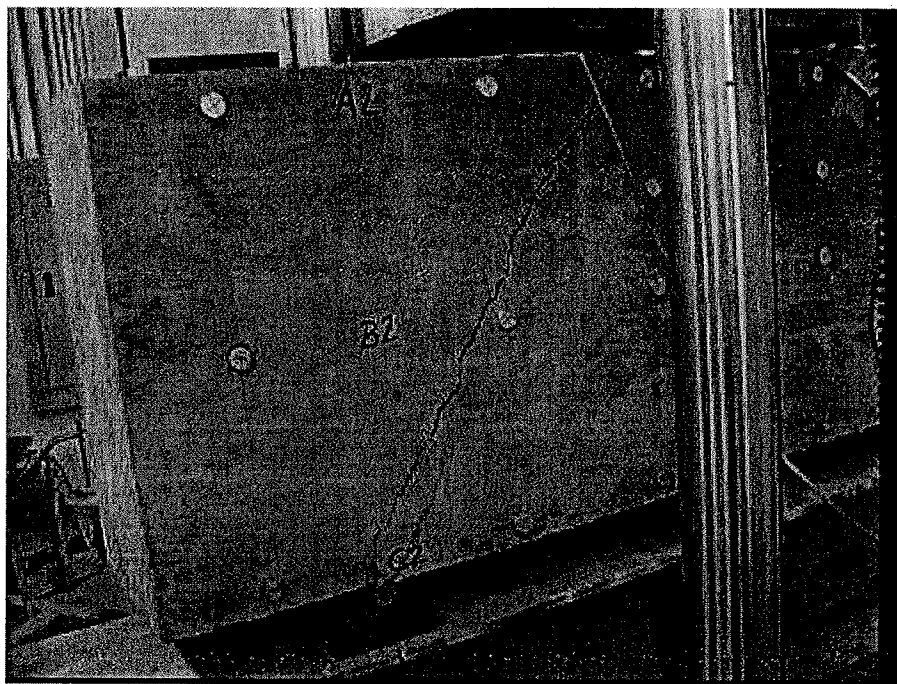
Crack in the center of BRC-2 beam due to flexure.
